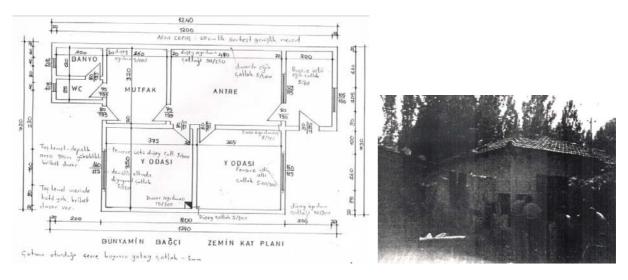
Building-B: Damage sketch on the layout plan (left) and photo of the building (right)
